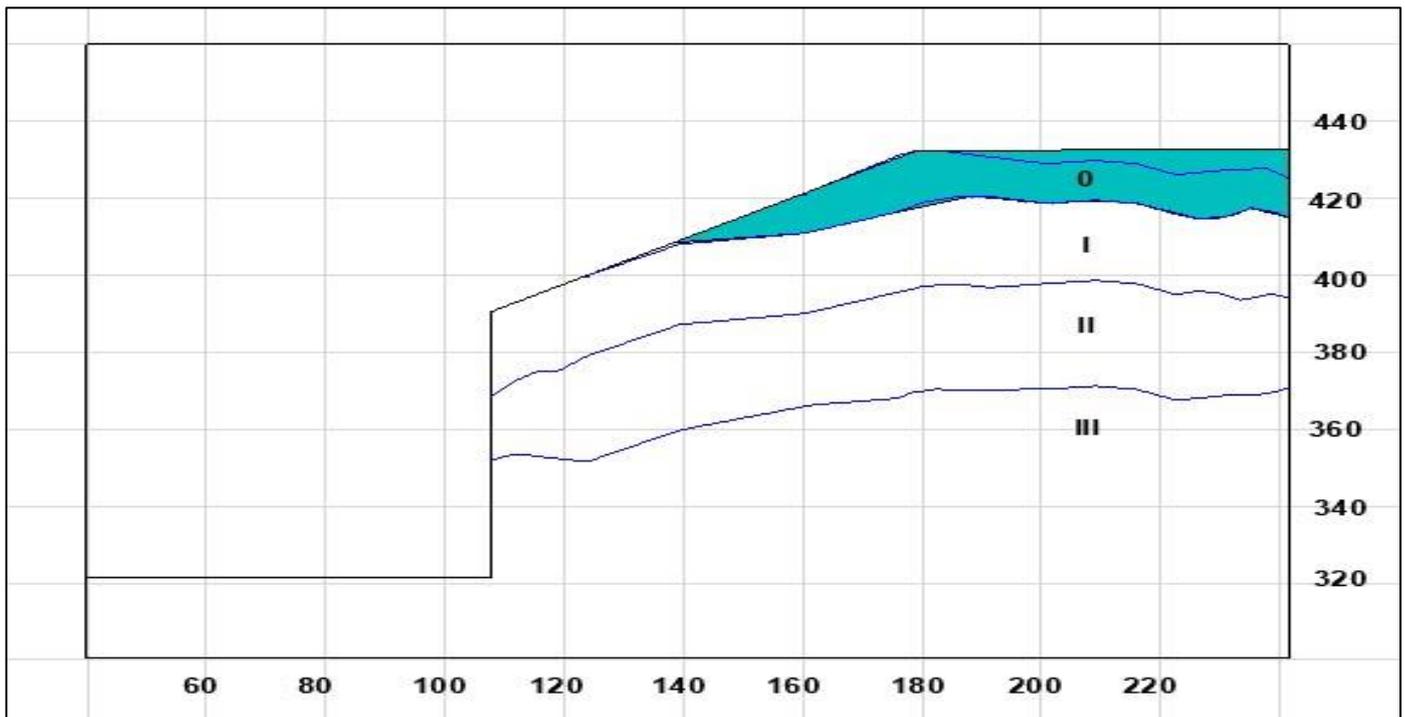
Destination of Soil Backfill (Arch-Cad 2019)
